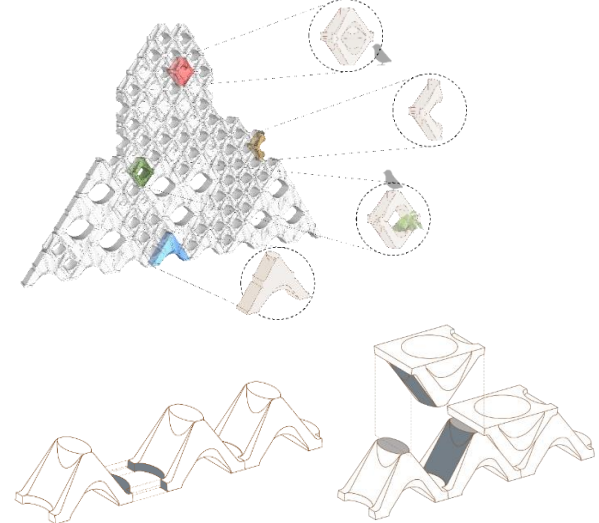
(top-row) final assembly from cast modules; (middle-row) drawing of different module types in the *Aviary*; (bottom-row) interlocking mechanism between the modules.
